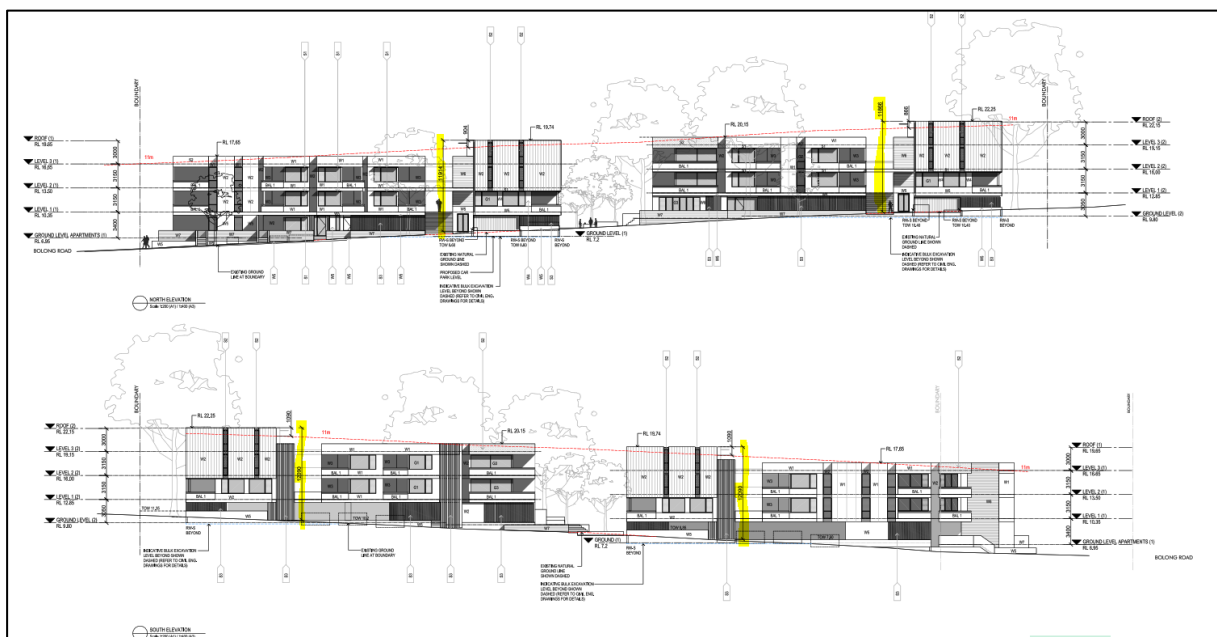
Elevation Plans noting peak building height (highlighted in yellow) and 11m building height limit plane (red line)
